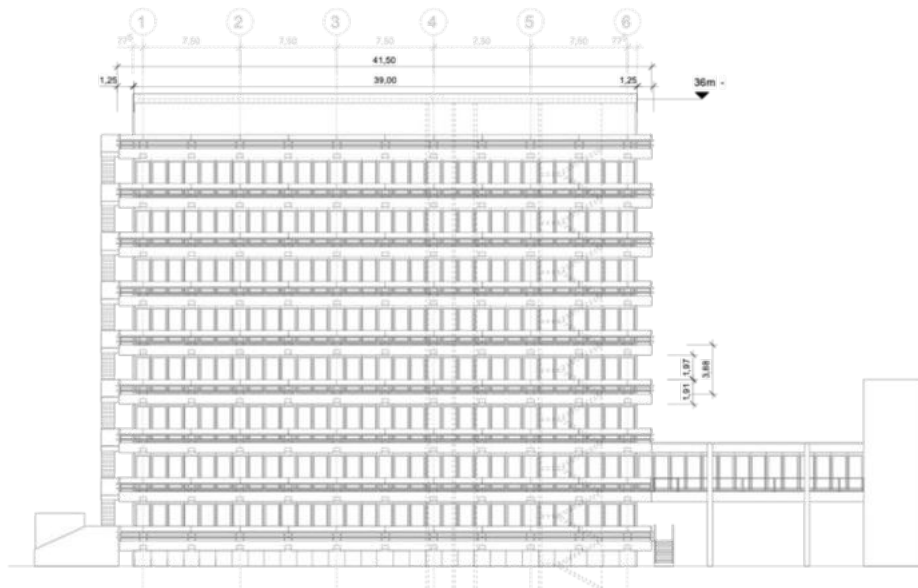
Elevation on south side of the existing building under investigation for the timber-reuse retrofitting.
